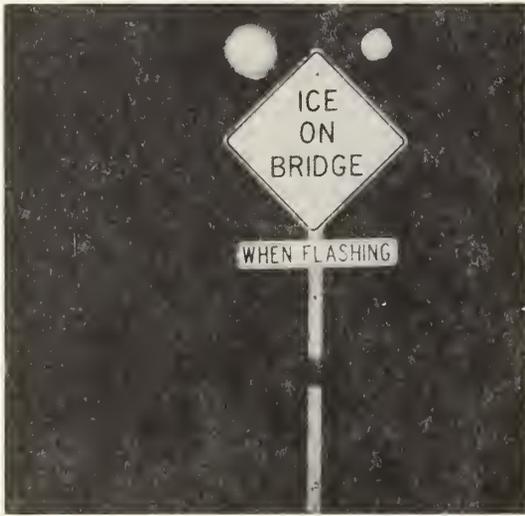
Samples of wet pavement and icy bridge warning signs in place at test sites.
